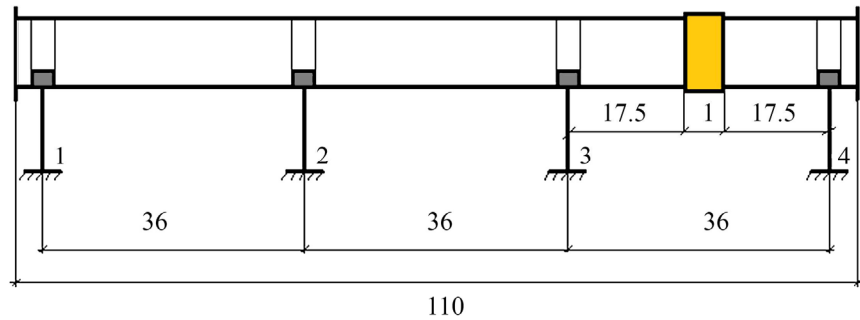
Diagram of a section of the trunk pipeline strengthened with a composite lining
